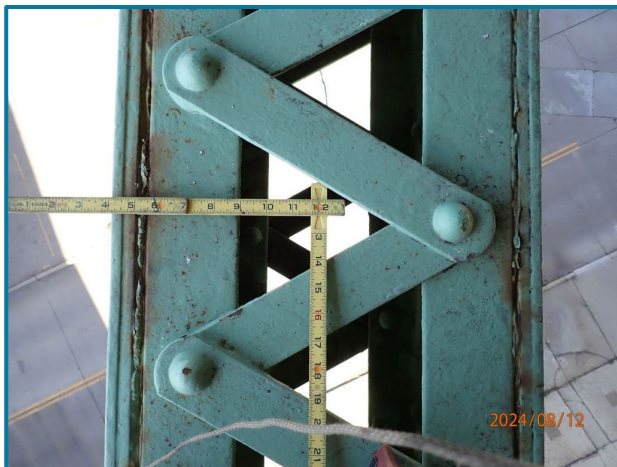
1/2” pack rust between the web and flange components (L6L7 of the South Truss, Span 10).
